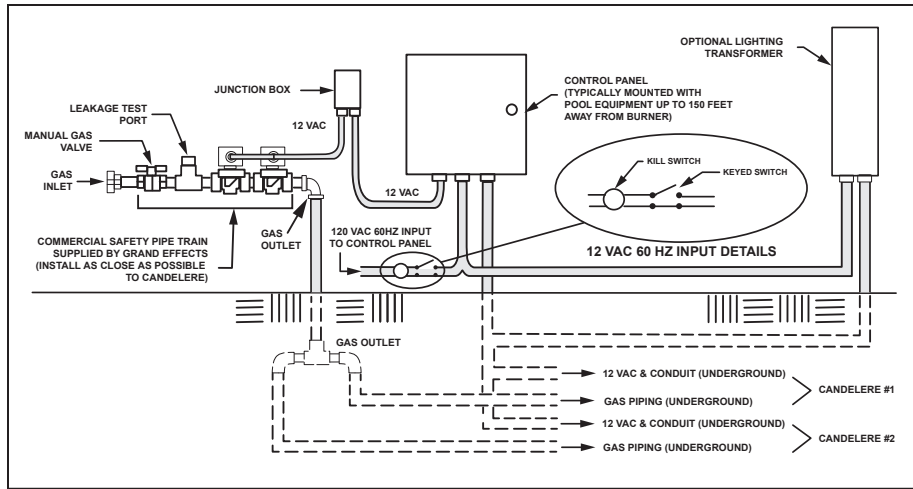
Commercial Installation Natural/Propane Gas Piping and Wiring
